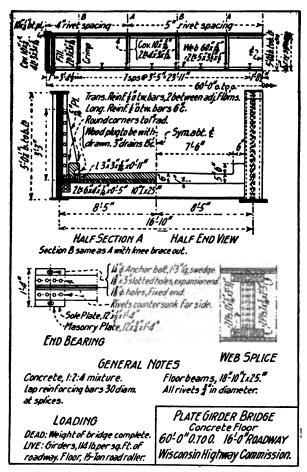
Plate Girder Highway Bridge. Wisconsin Highway Commission.
